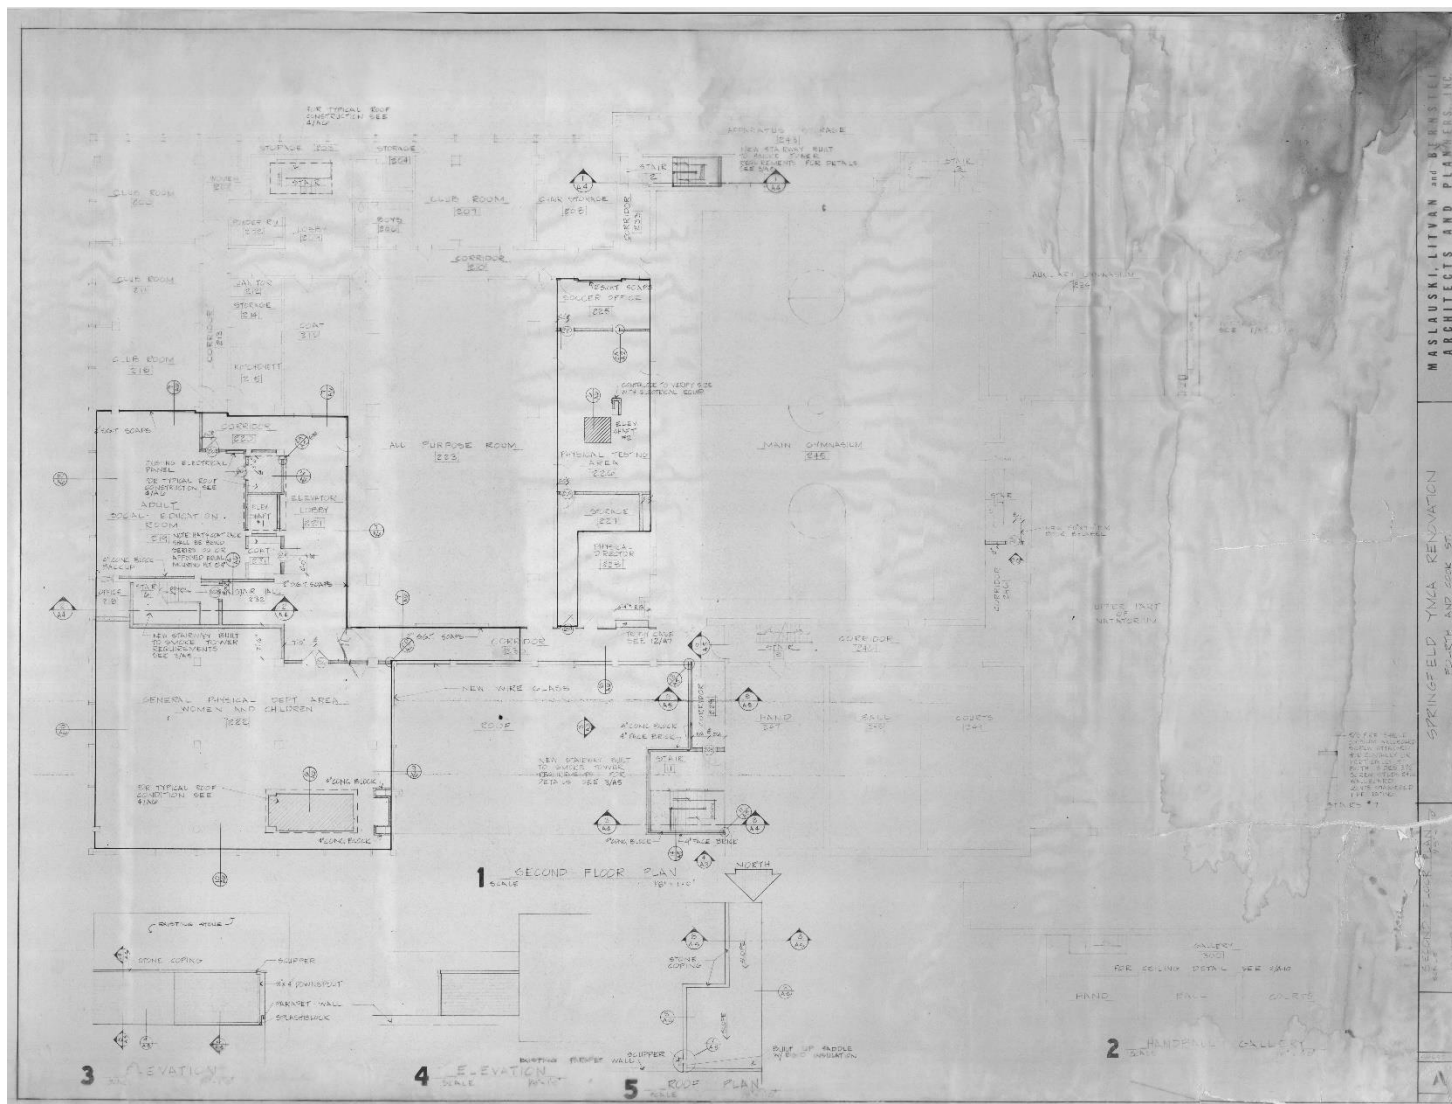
Second Floor Plan, Springfield YMCA Renovation (Maslauski, Litvan and Bernstein 1975; Sheet No. A3). [December 8, 1975].
